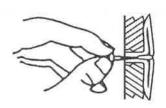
Attaching Wall Hanging Spacers to Heater
